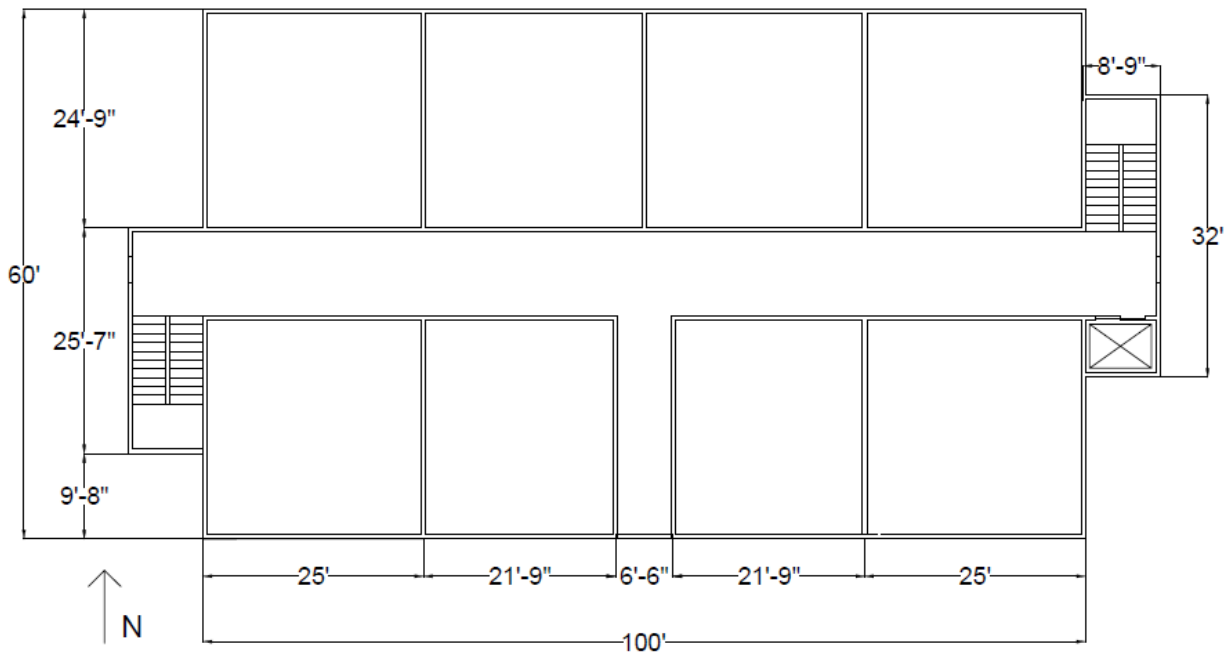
Typical Building Floor Plan (Reproduced from Huenefeld, J., & Kramer, K., 2012)
